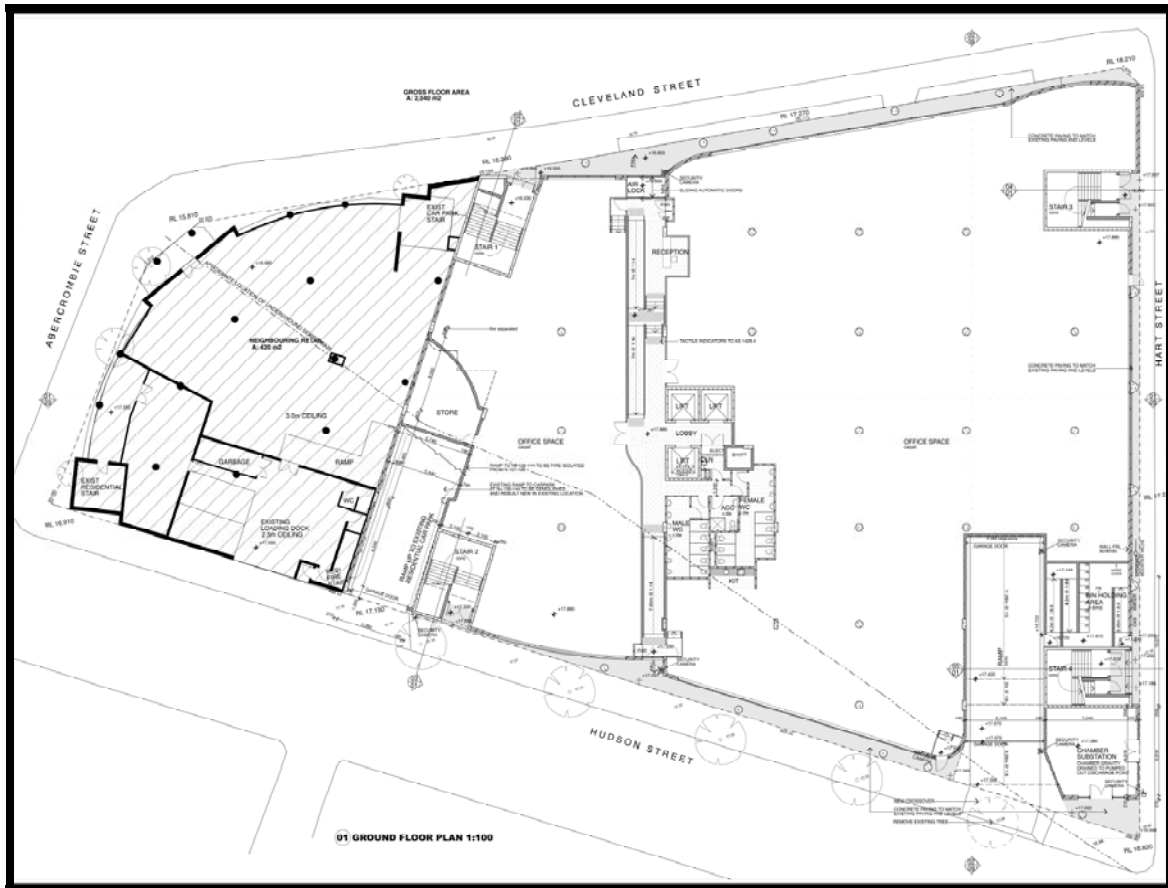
Ground floor plan of proposed development (not to scale). (Source: Fortey + Grant Architecture, 2010)
